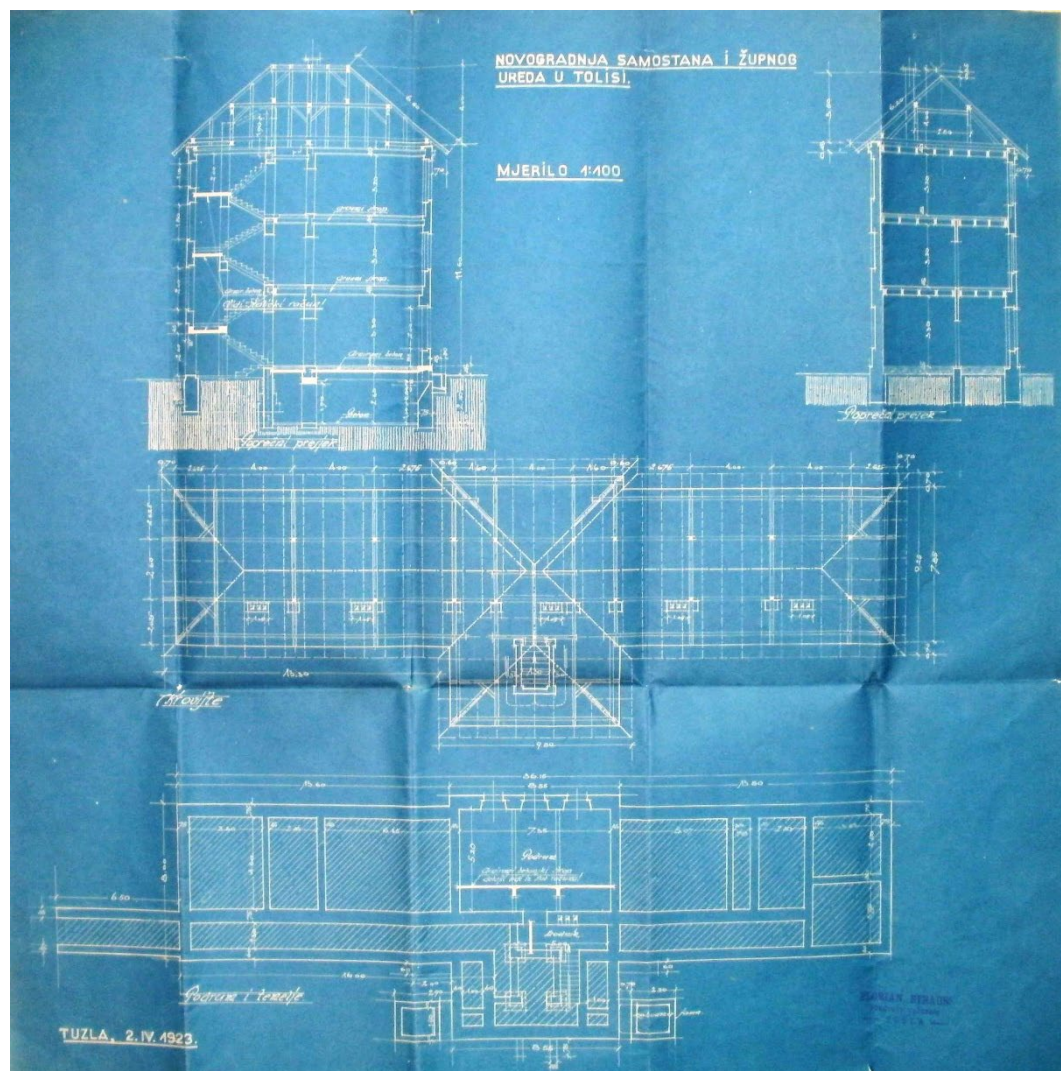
The Convent of the Assumption of Mary: floor plans of foundations and roof plan, and cross sections, a segment of the project „New construction of the convent and parish office in Tolisa“ done by architect Florian Strauss, dated April 2, 1923 [7]
